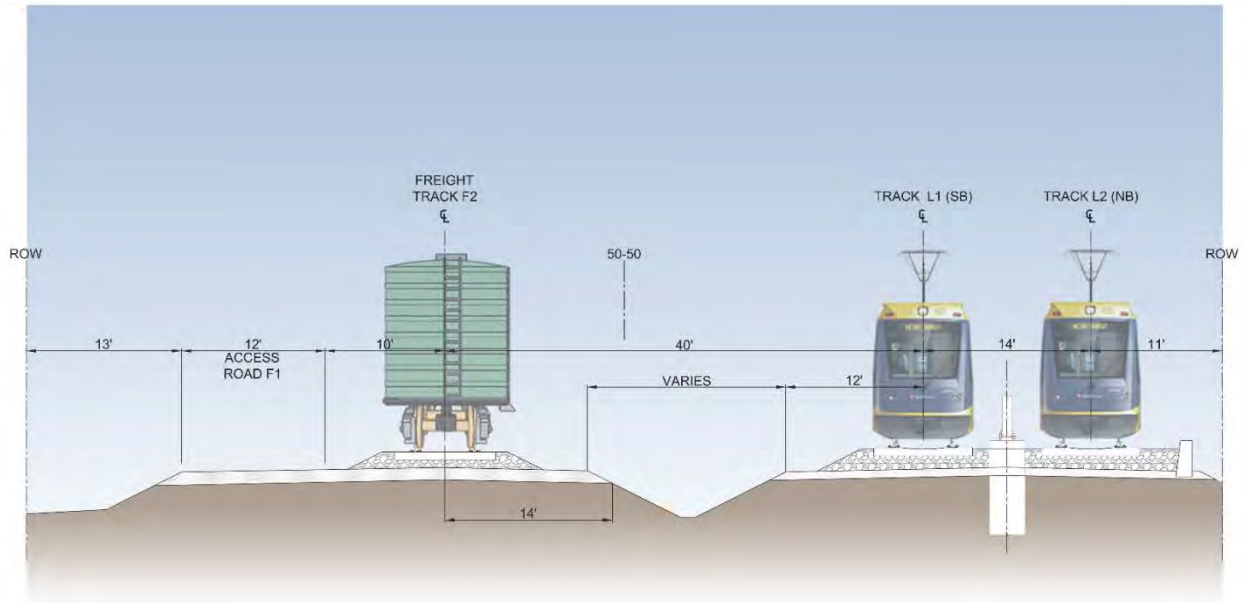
Typical Railway Section – Retained Embankment Corridor Protection
